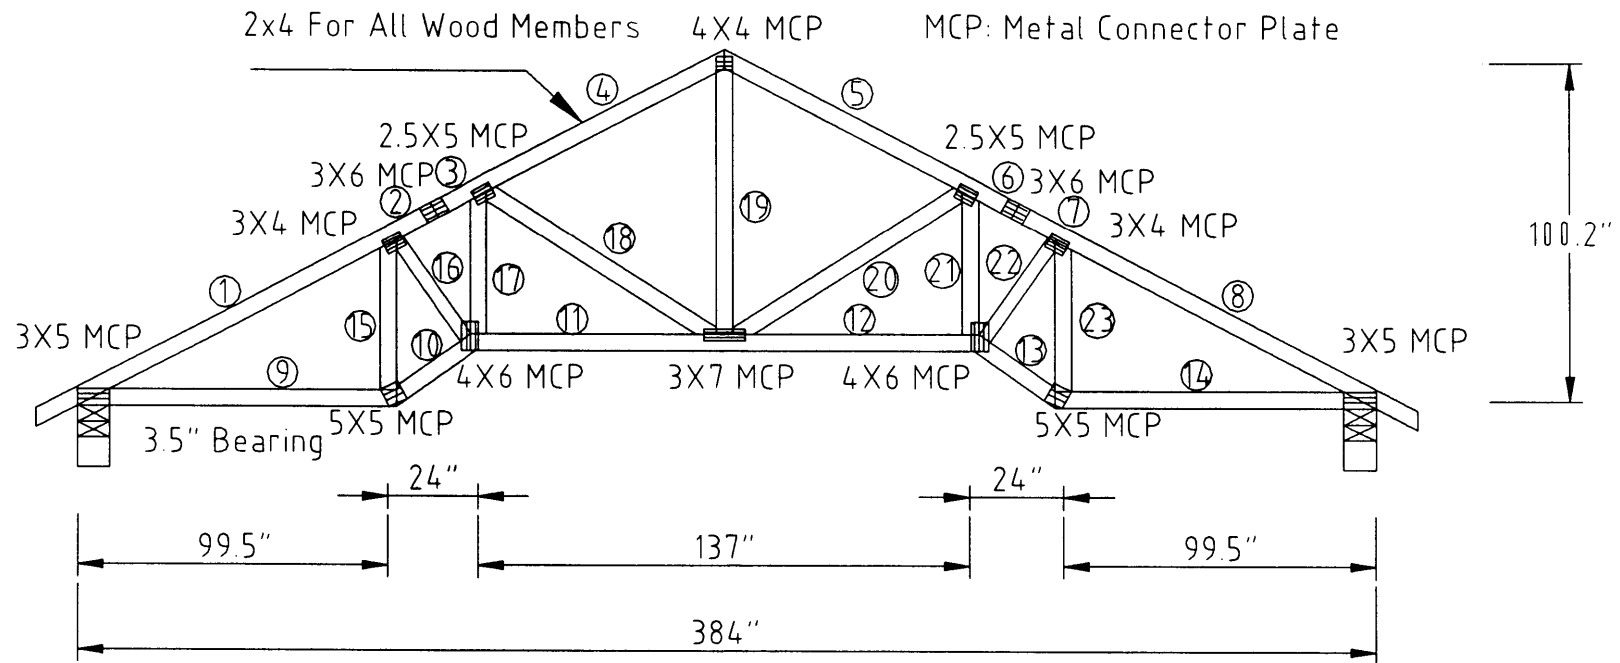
MPC Truss Type A2 from a Truss Plate Manufacturer
